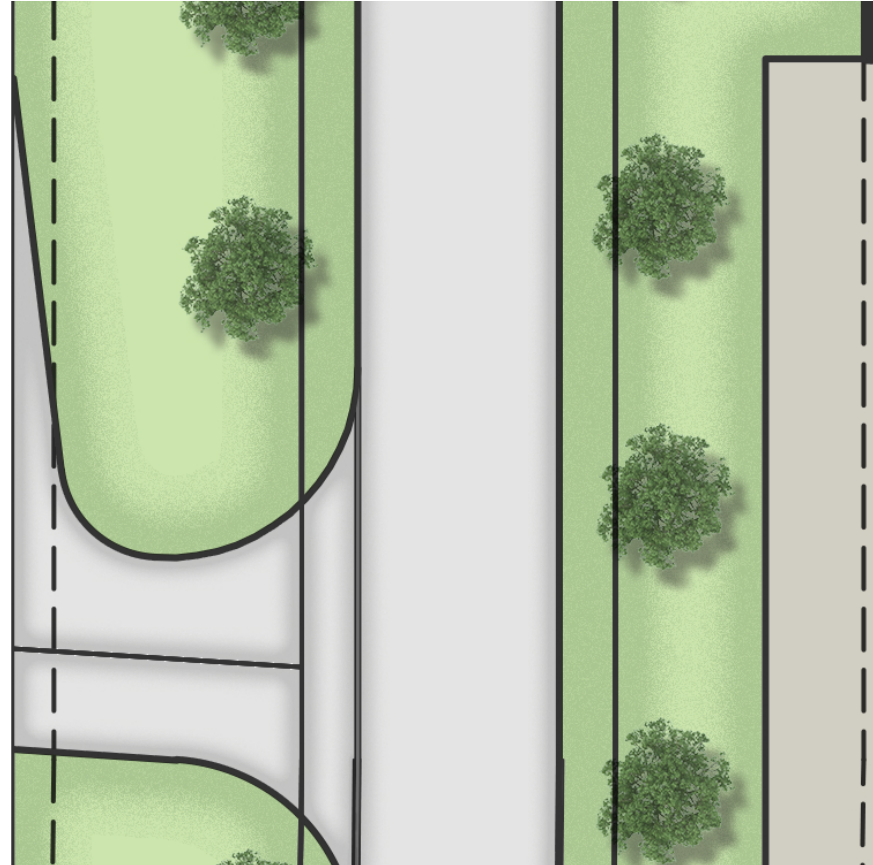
TYPICAL STREETSCAPE TREATMENT
